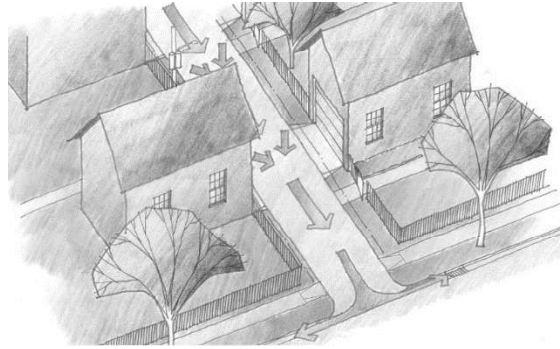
Sloped alley with walkway ramps and driveway aprons channeling water to the existing sewage system (Chicago Department of Transportation 2007)
